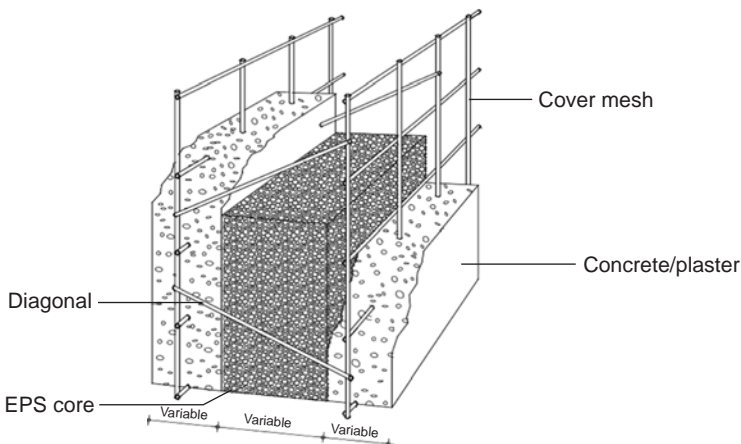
Isometric view of typical cross section of RCSP sandwich panel
